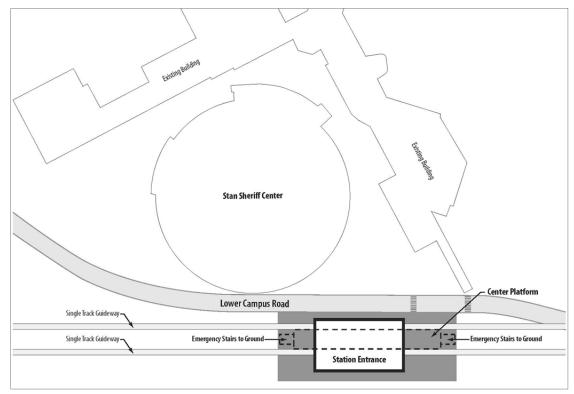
Beretania Street Tunnel Alternative UH Mānoa Station
